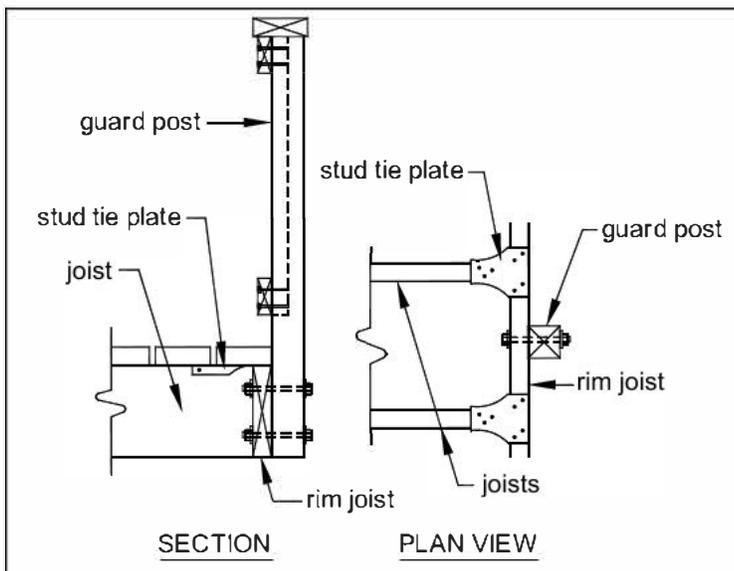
GUARD POST TO RIM JOIST DETAIL, OPTION 3
